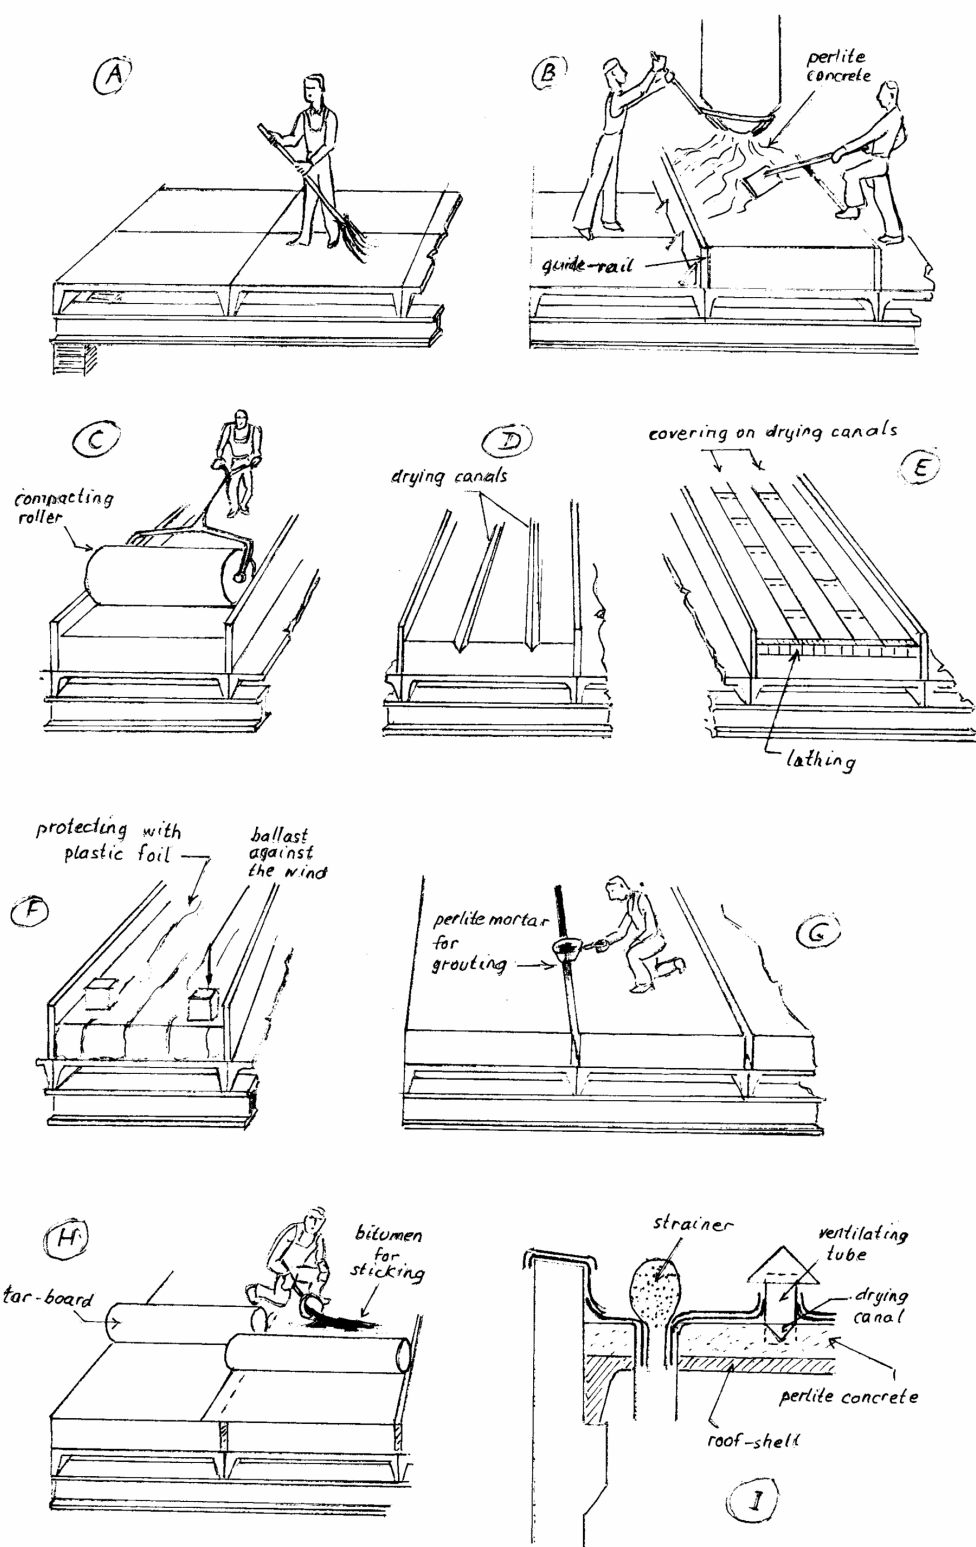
Processing technology of in-situ perlite concrete roof insulation
